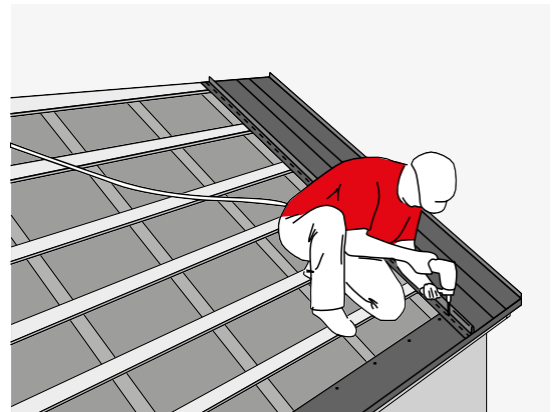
FIXING THE PANEL TO THE ROOF PLANE
